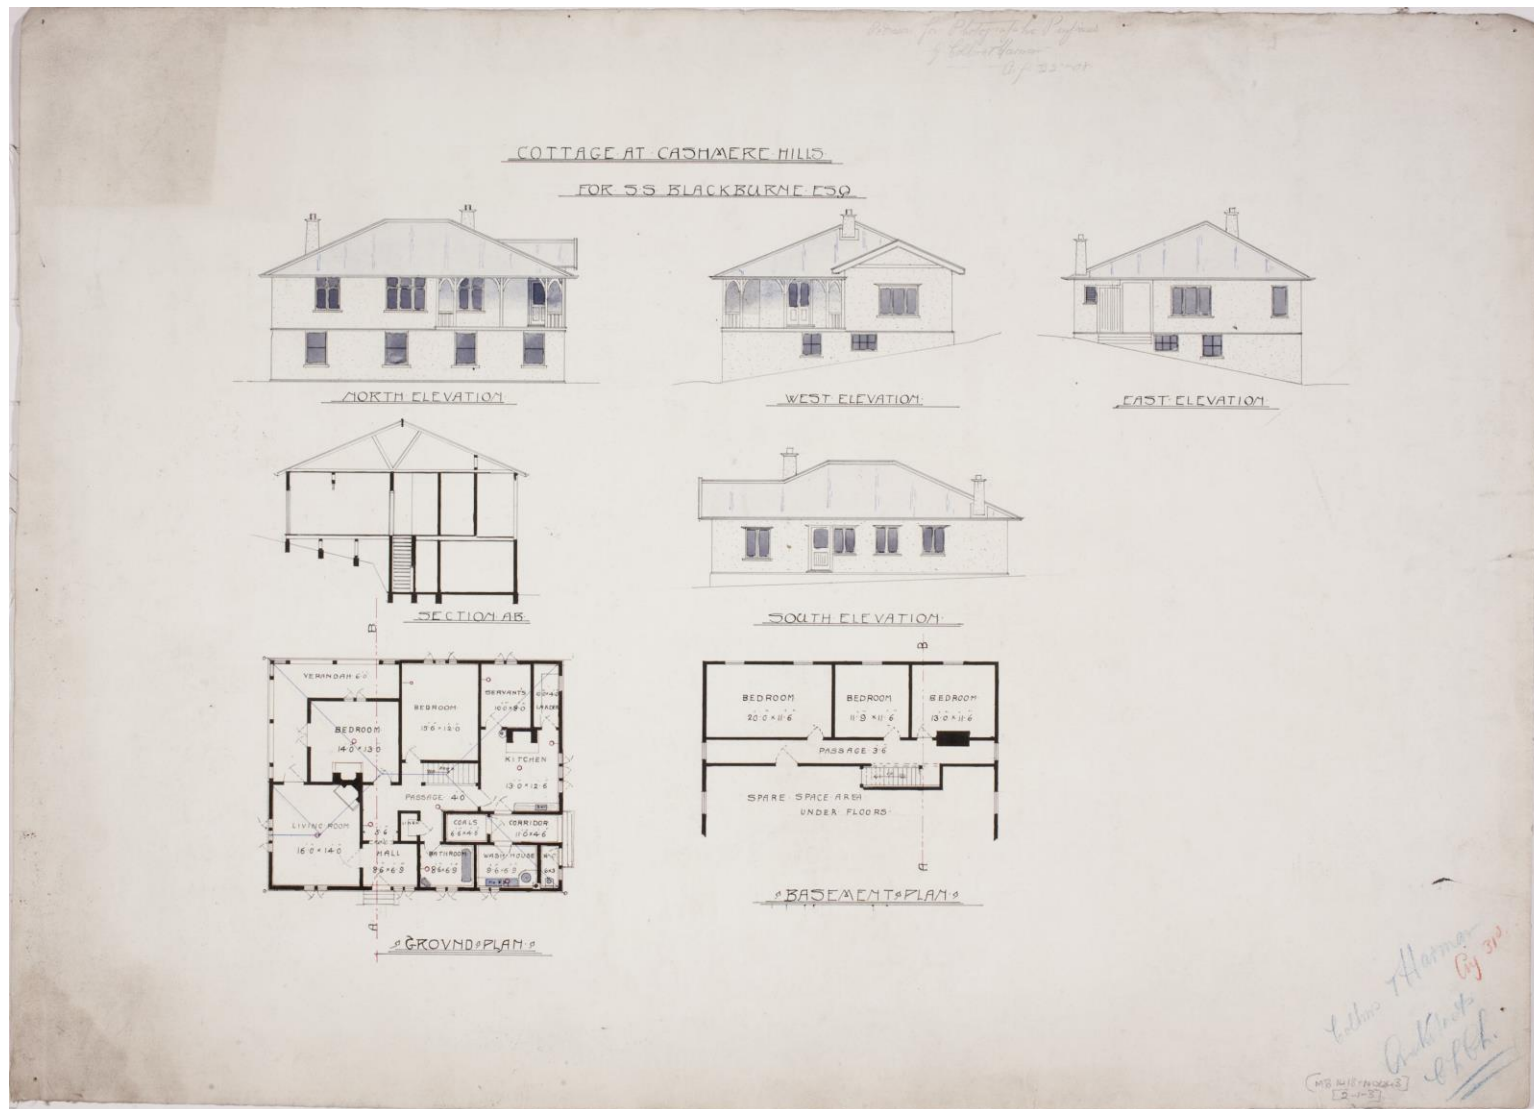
Collins and Harman, Cottage at Cashmere Hills for S. S. Blackburne, Esq., plans, elevations and section (1908).
